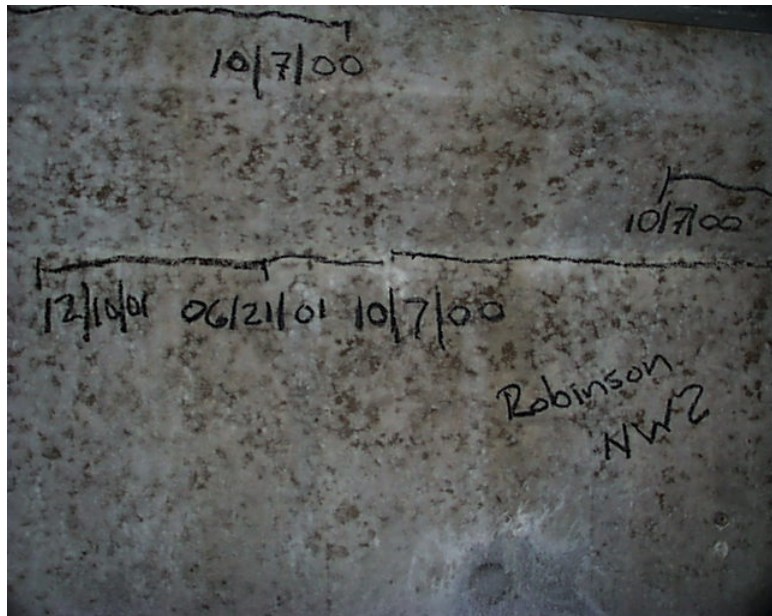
Extension of cracking on north surface of NW Girder 2, Robinson Road, at west abutment (12/10/01)
